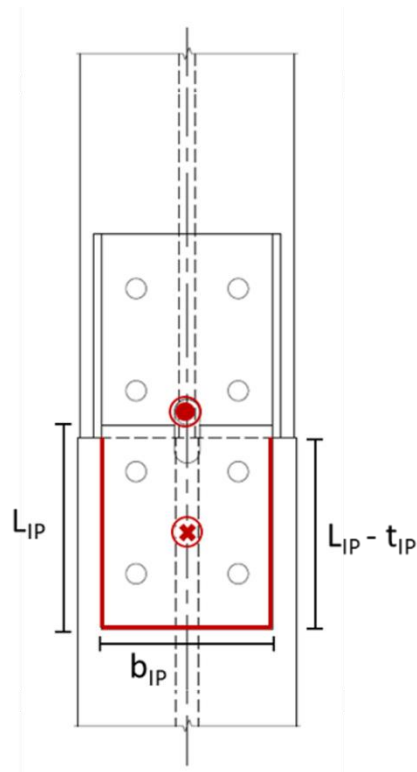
Location of the welds attaching the Inner Plate to the Lower Column.
